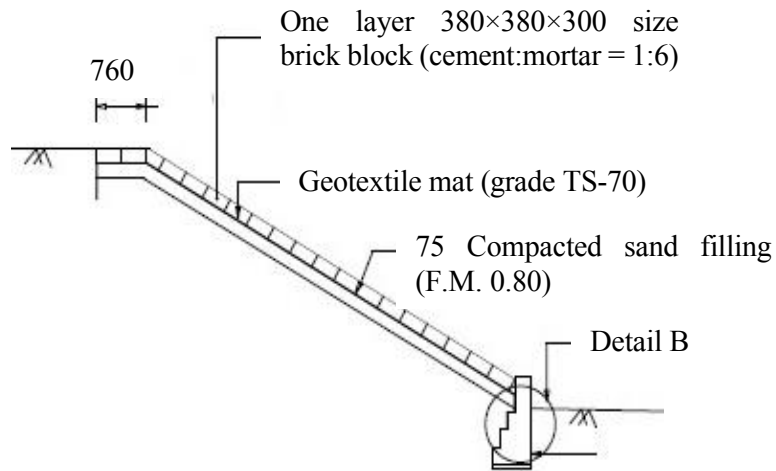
Conventional slope protection brick toe with brick blocks and geotextile over the slope (Road Design Standards, LGED, 2005)
